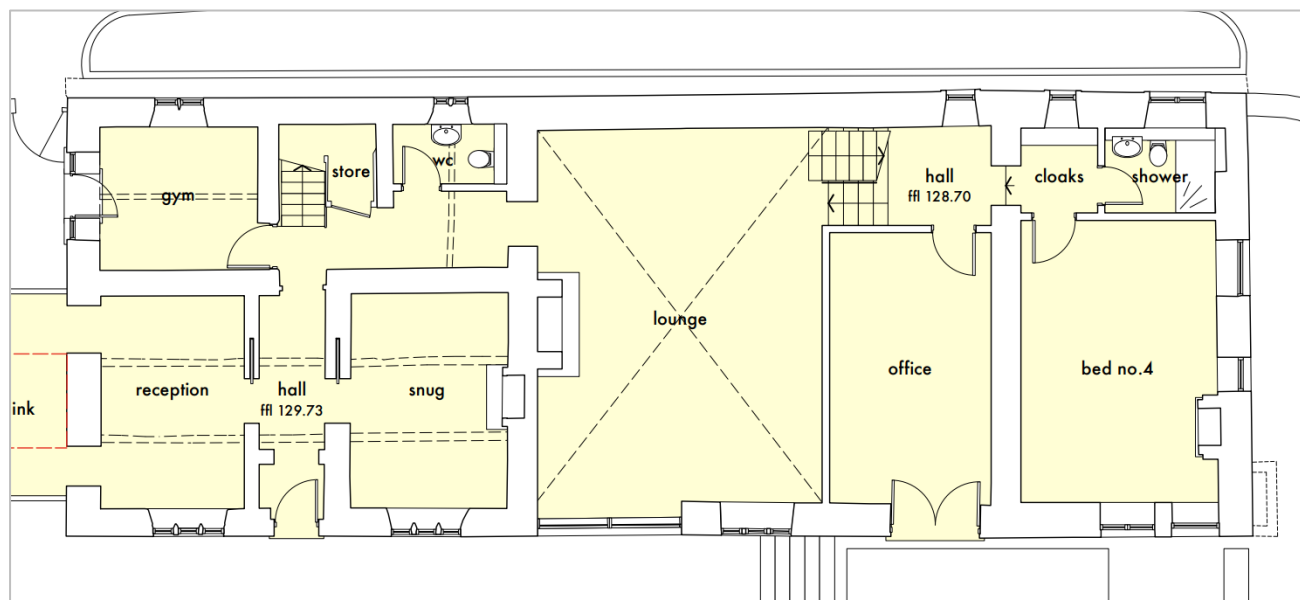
Enlarged proposed ground plan of the house showing hallway reinstated within the house and 'lounge' opened up above as full height space
